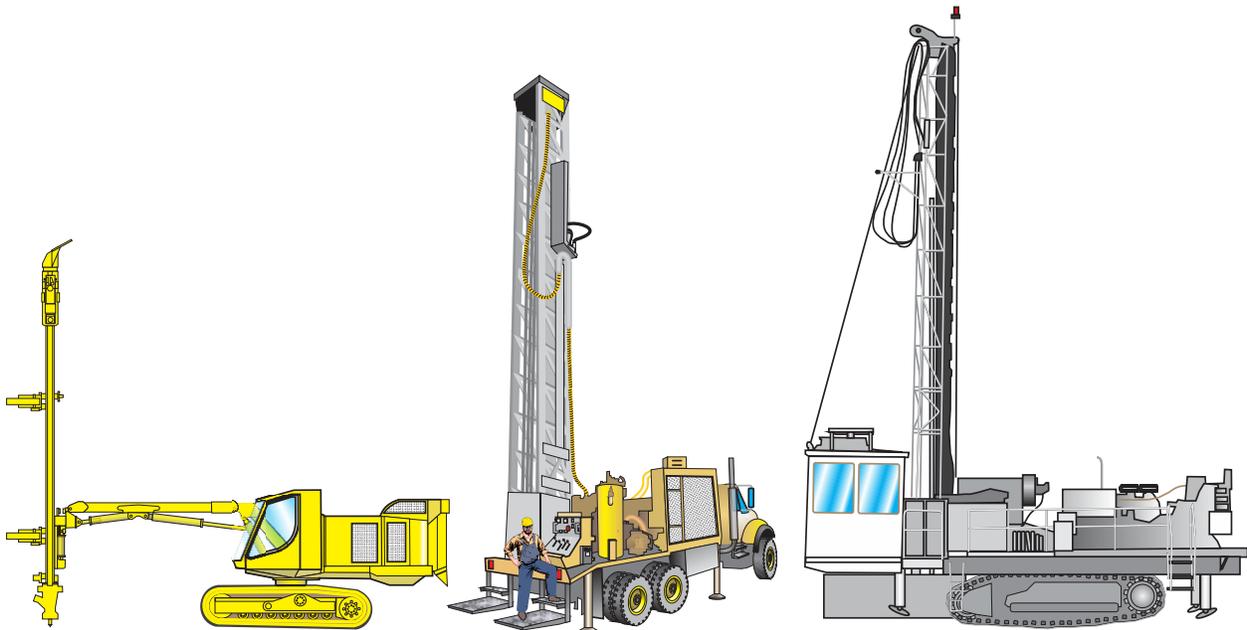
Illustrations depicting three types of rigs. A small surface crawler drill rig is on the left, a truck-mounted drill rig is in the center, and a large track-mounted drill rig is on the right.
